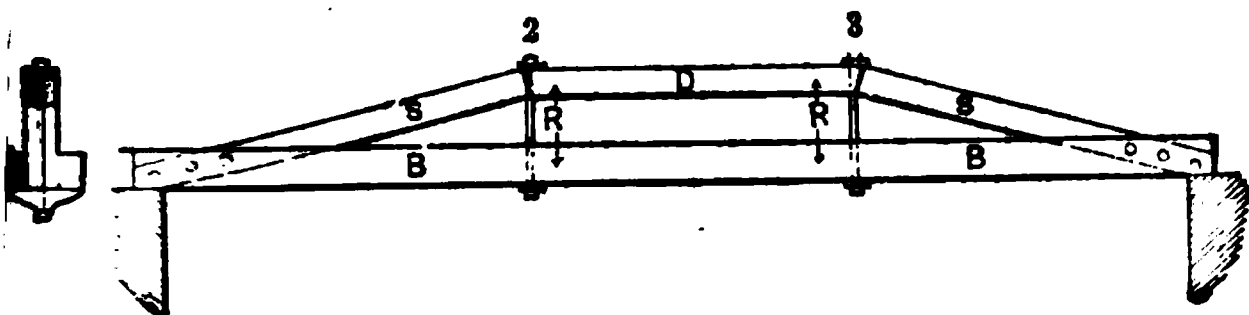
Trussed Wooden Girder. Two Vertical Ties
